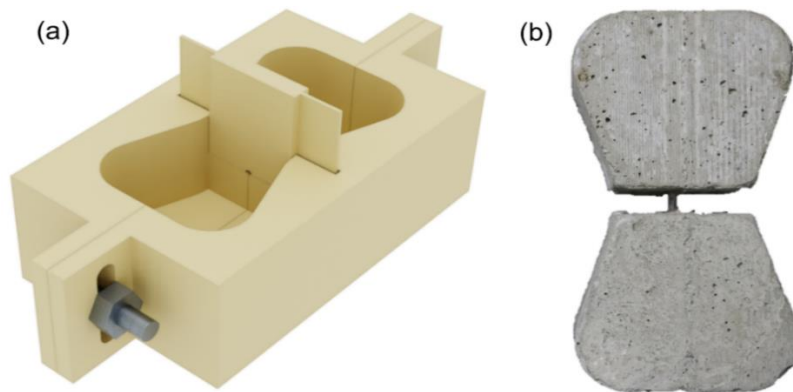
a) Mold for pullout test manufactured by 3D printing; b) Specimen after demolding.
